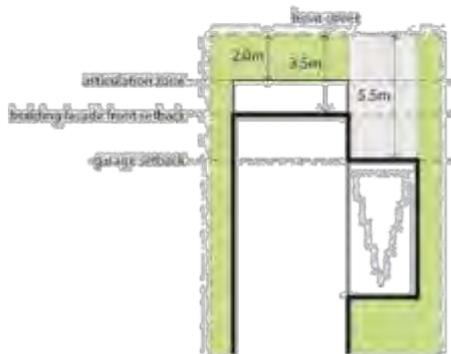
Minimum front setbacks for dwellings fronting open space or drainage land
